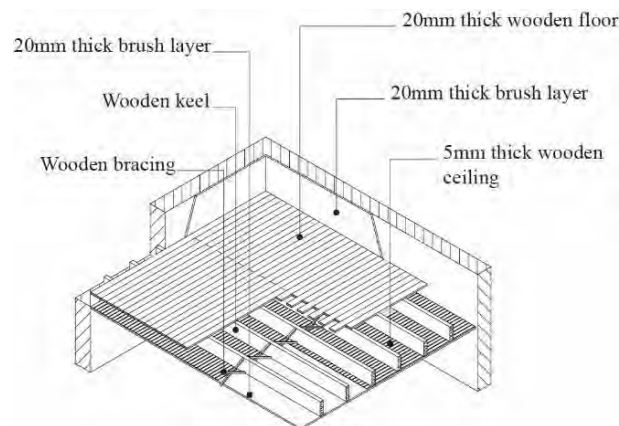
Floor structure (Image source: Professor Zhou Qi's studio at the School of Architecture, Southeast University)
